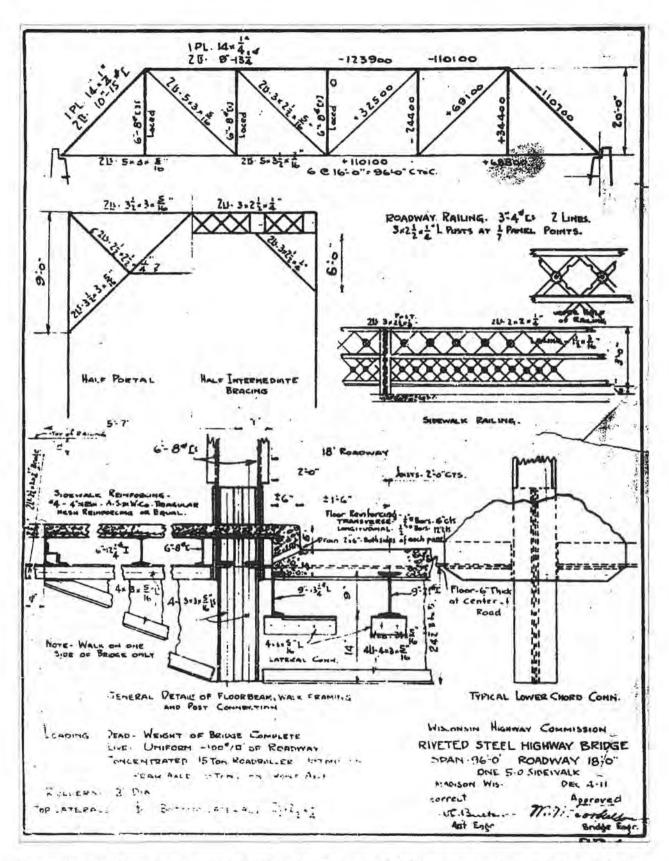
SHC standard plan for Pratt overhead truss with 96-foot span, 1911. (Source: SHC files, WisDOT).
